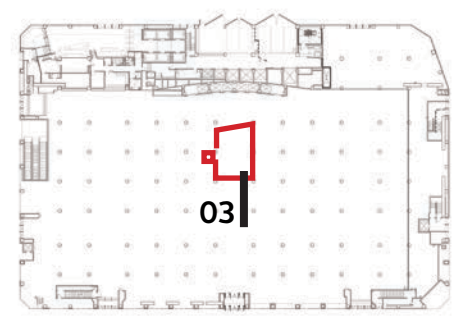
| SECTION AT LEVEL 1 CEILING
